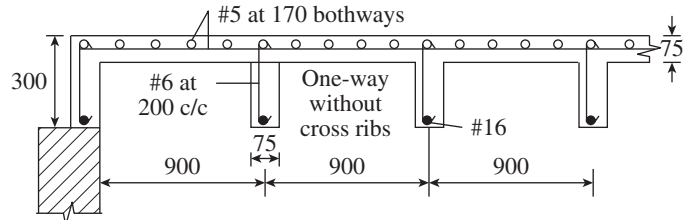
Detailing of ribbed slab of Example 9.5
